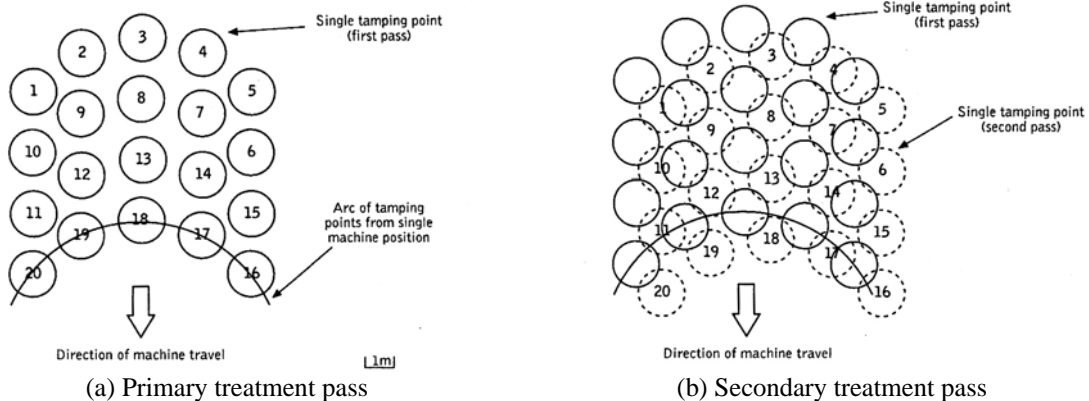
Typical plan layout of tamping points. Sweep and track (BSP doc 1).
